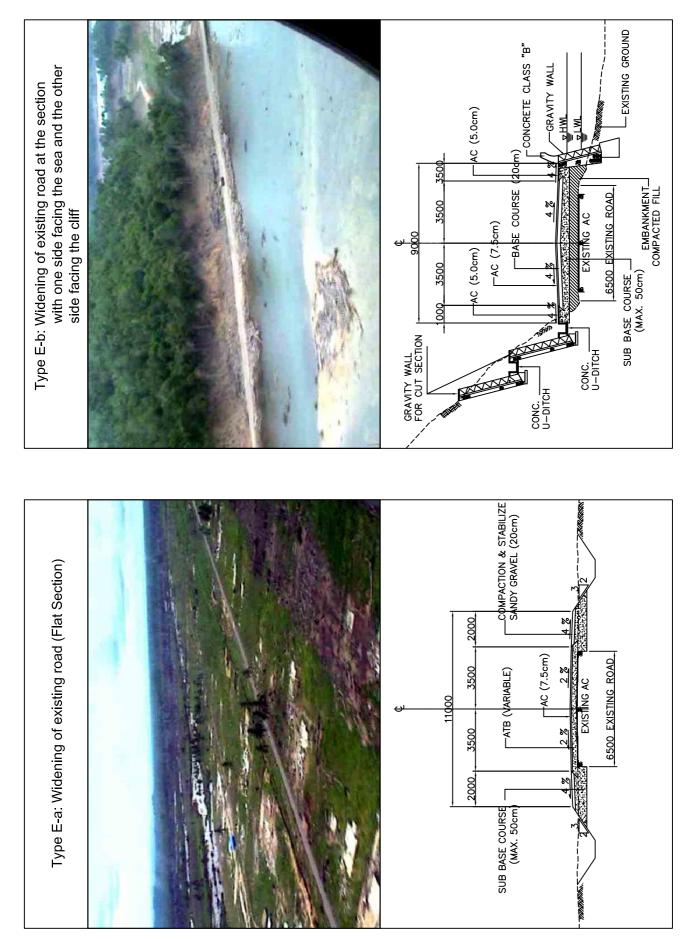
(1/5) TYPICAL CROSS SECTIONS
